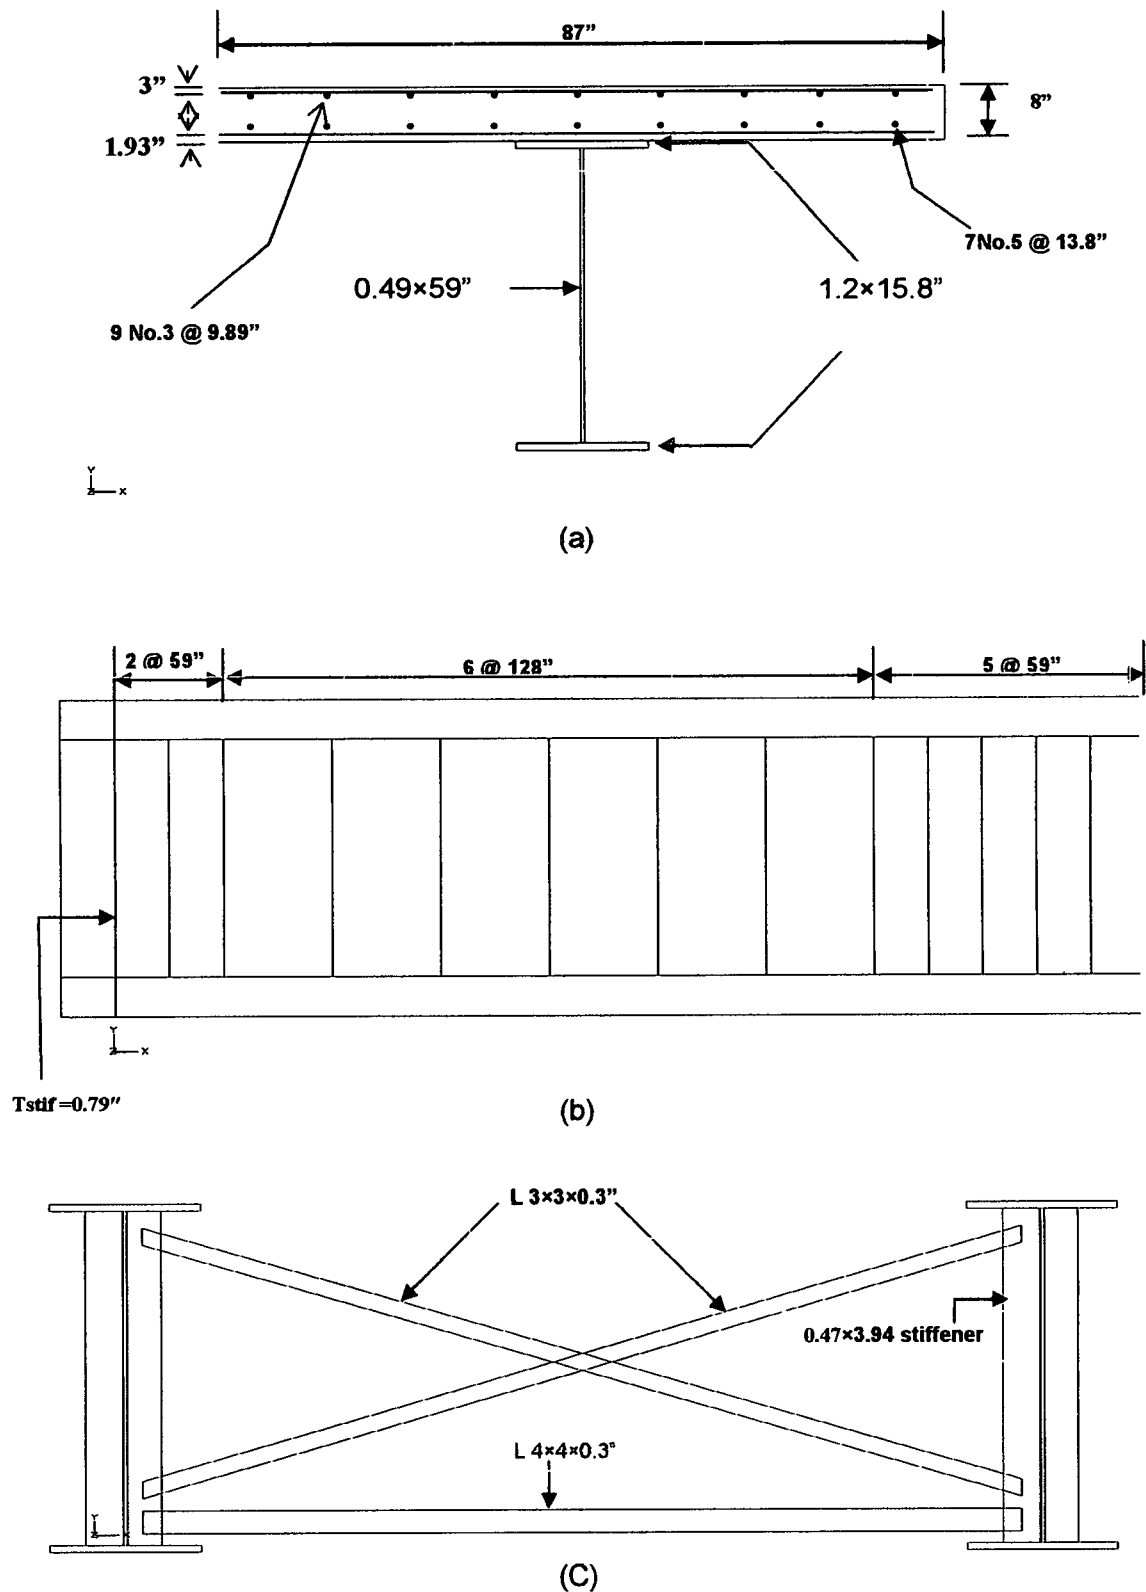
Bridge geometry. (a) Cross section. (b) Stiffener detail. (c) Cross frame details (the drawing is not to scale)
